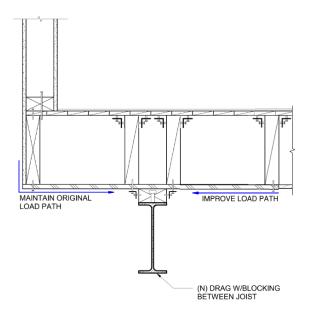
Force transfer through straight sheathing to a new collector (or drag), with the addition of plywood to the underside of existing framing.
